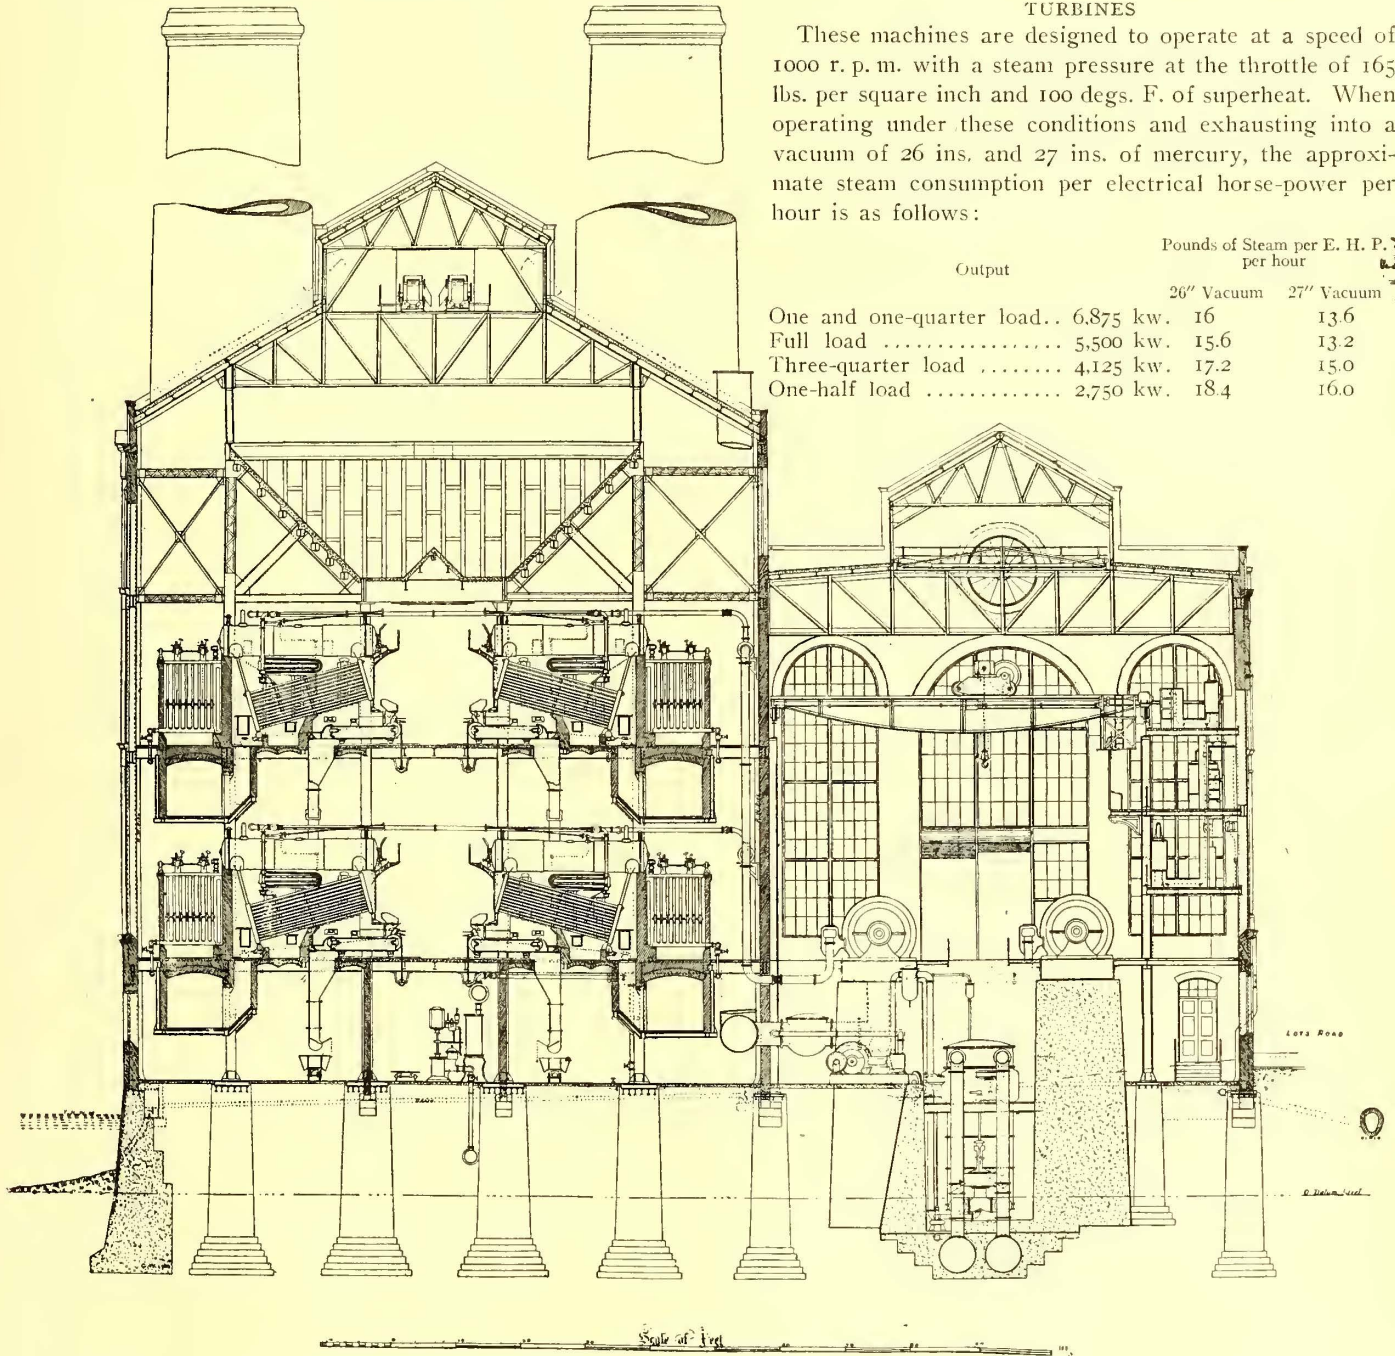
TRANSVERSE SECTION THROUGH ENGINE AND BOILER ROOMS
